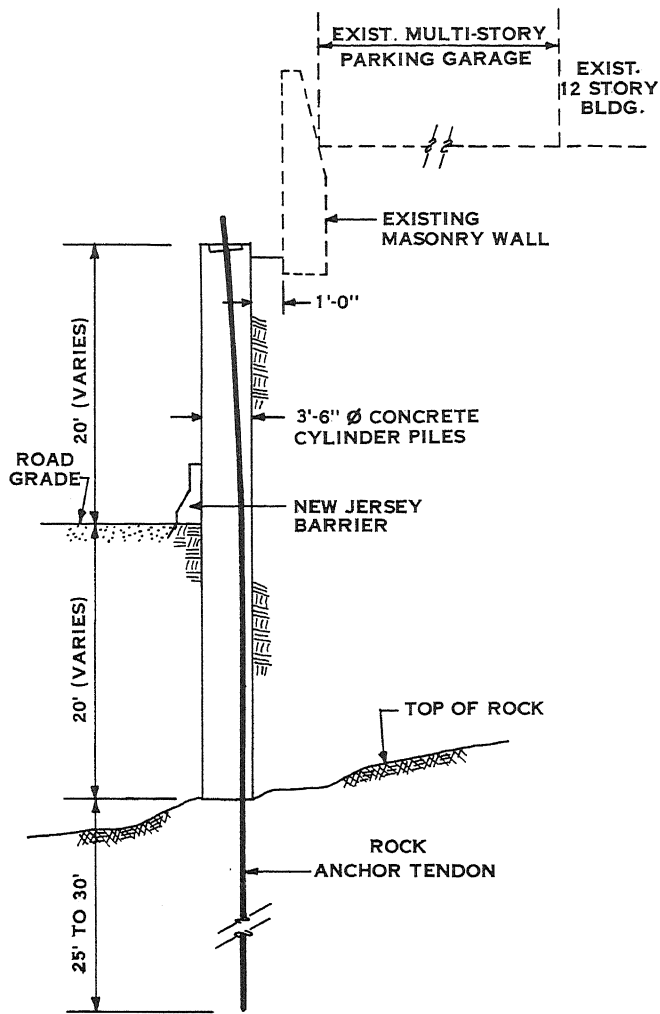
POST-TENSIONED CAISSON RETAINING WALL
